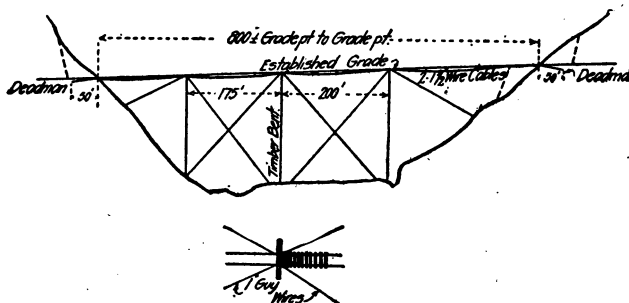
Side View of Wire Rope Trestle for Making Large Fill.
